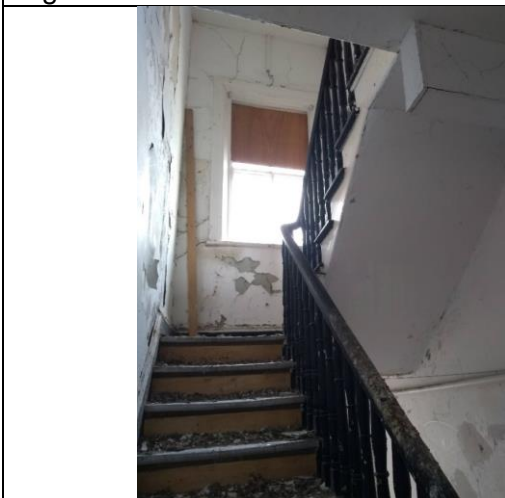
Surviving dogleg, open string staircase with continuous handrail.
